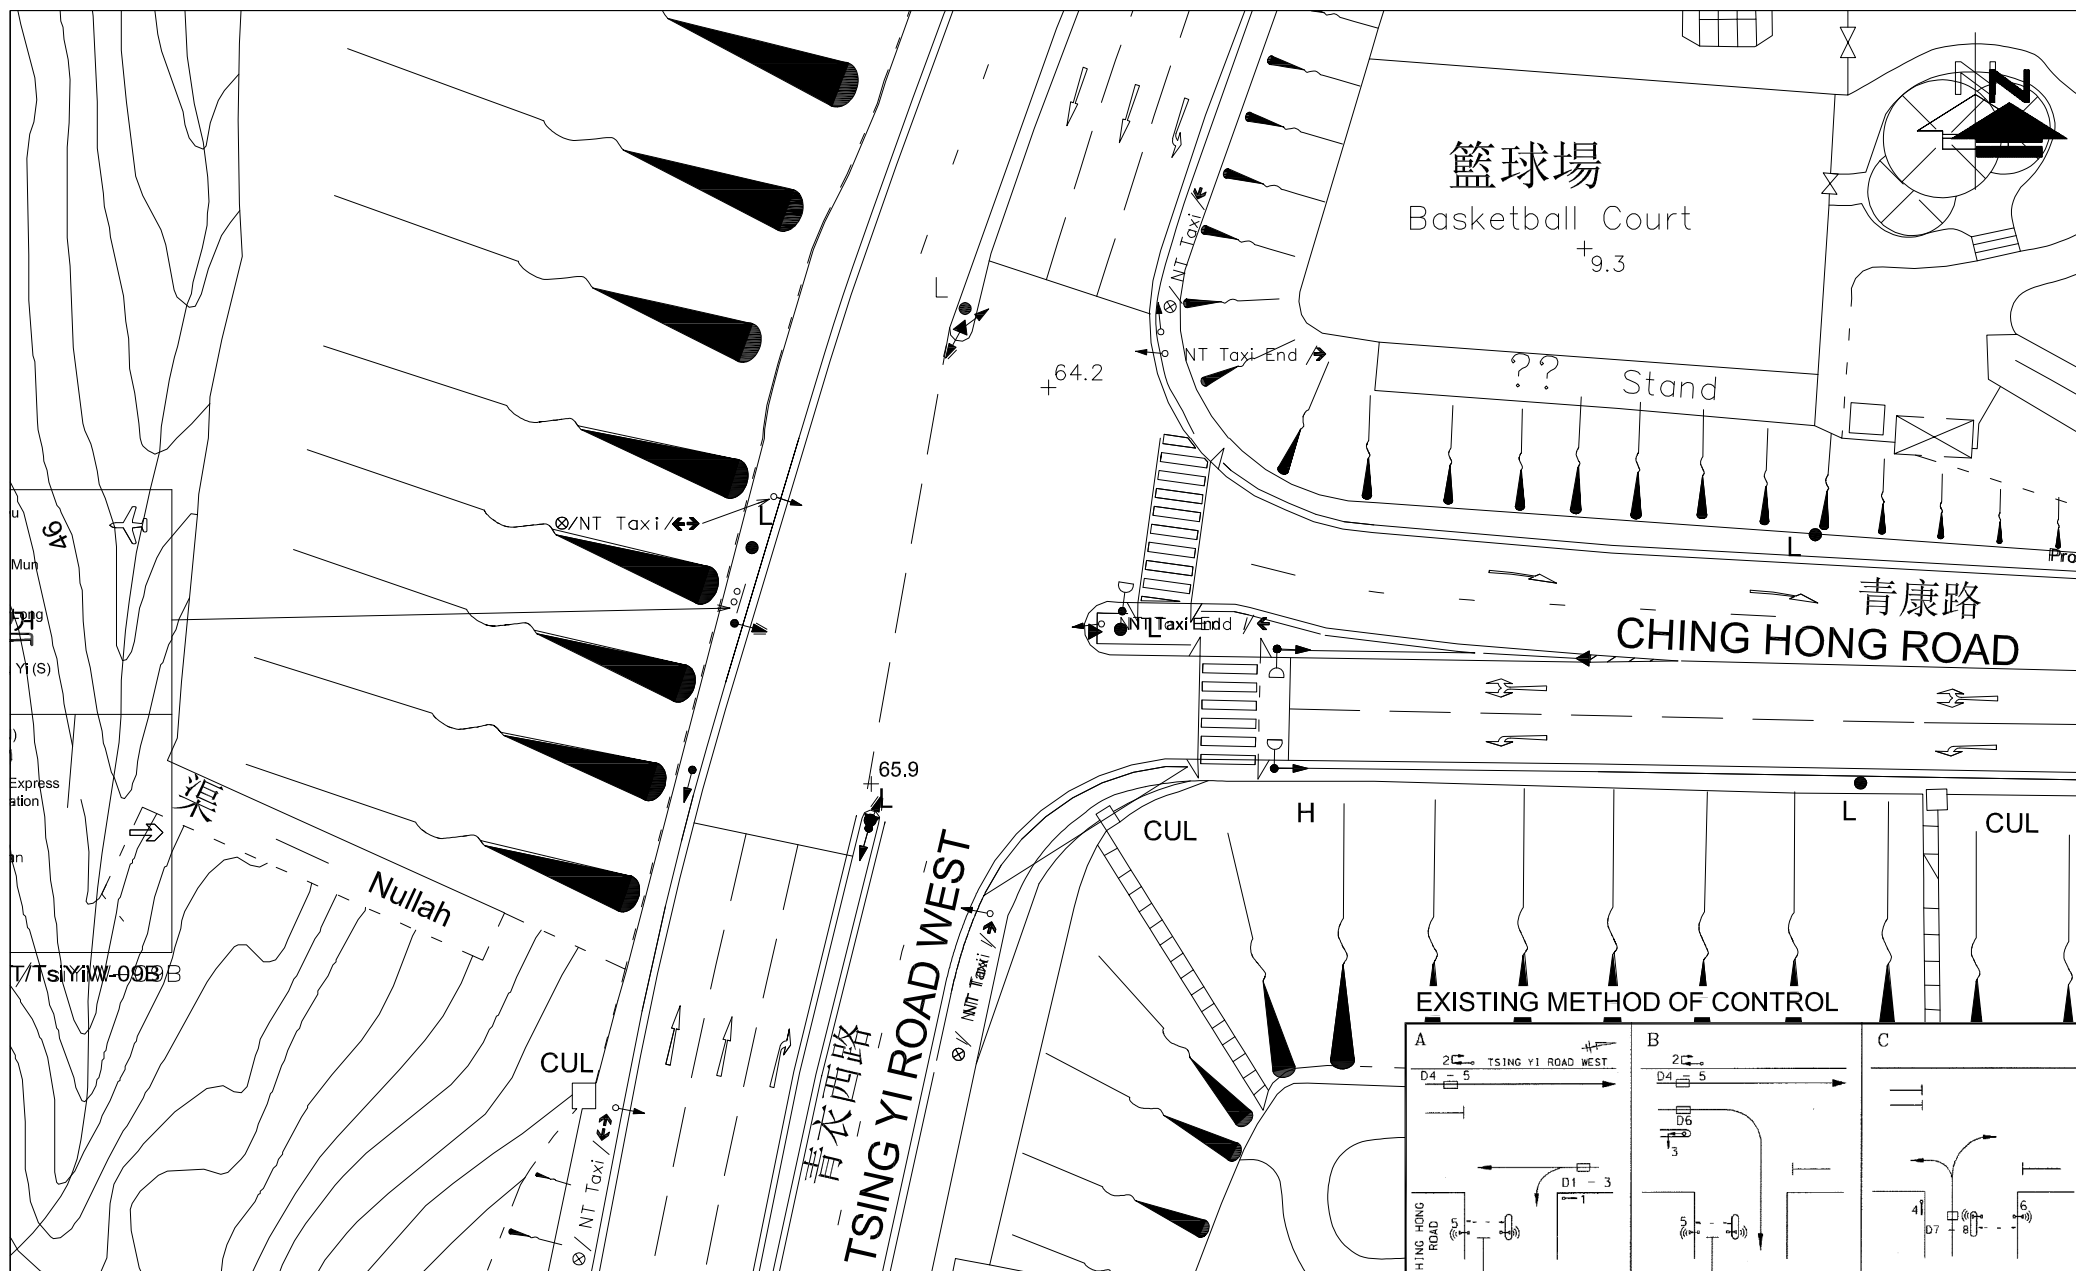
PROJECT TITLE: Planning Approval Renewal - Asphalt Plant at Sai Tso Wan Road A/TY/135, TYTL108 RP
